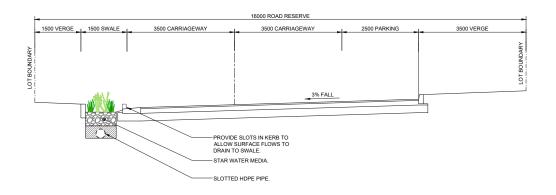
Road Scale Retention Swale Cross Street - Typical Section (Source: Craig & Rhodes)
